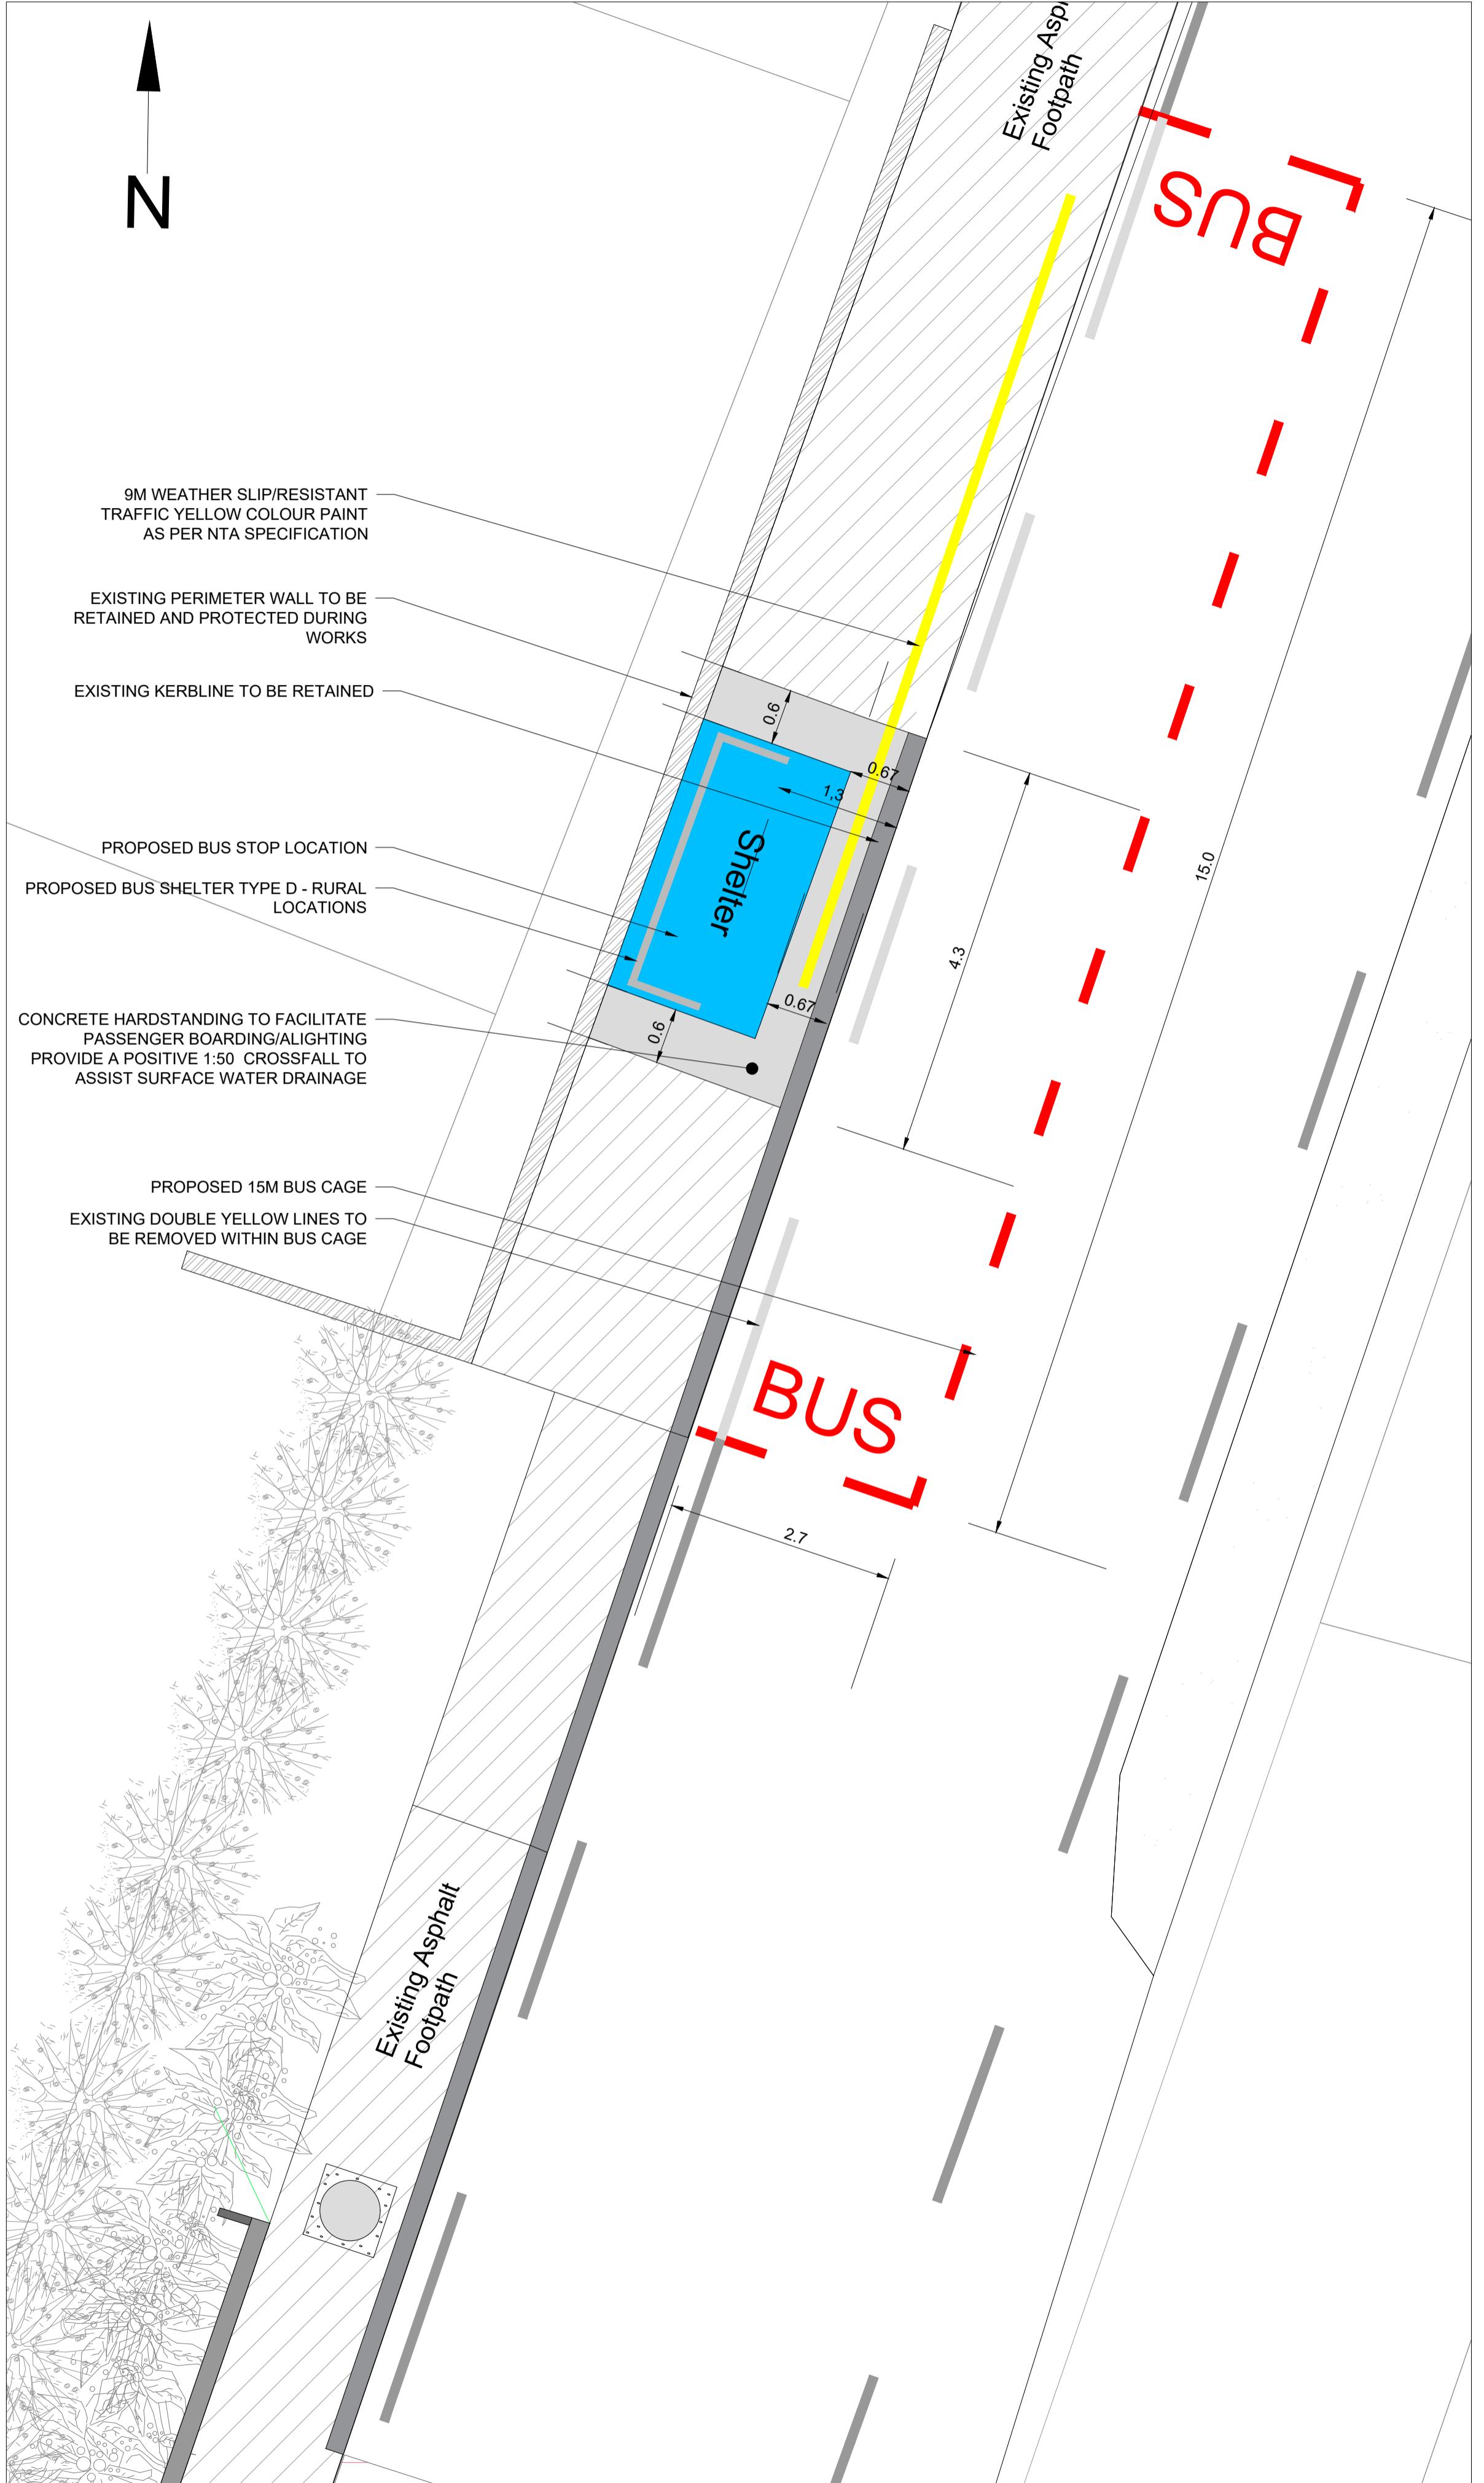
DETAILED LAYOUT PLAN- NORTHBOUND BUS STOP
